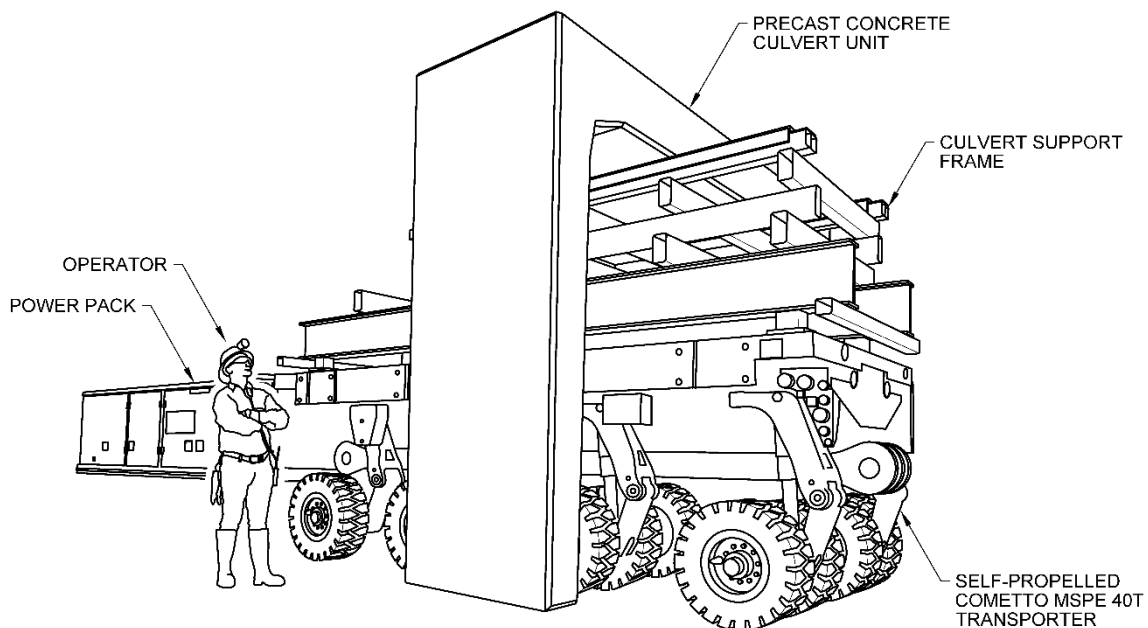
Cometto four axle self-propelled modular transporter used to place culvert units.
